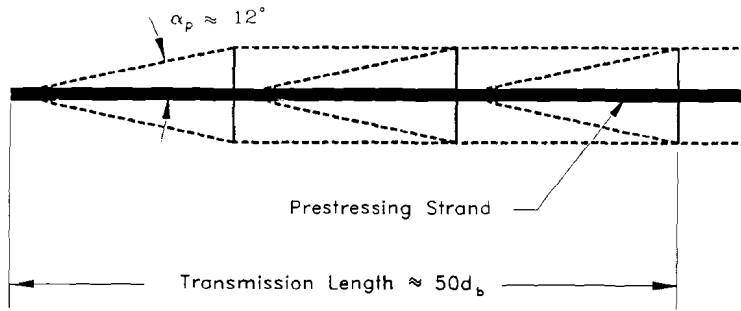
Strut-and-tie model for transfer of prestress to concrete (adapted from Ref. 8).
